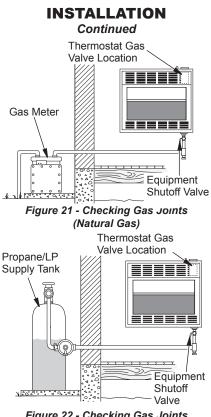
Checking Gas Joints (Propane/LP Gas)
